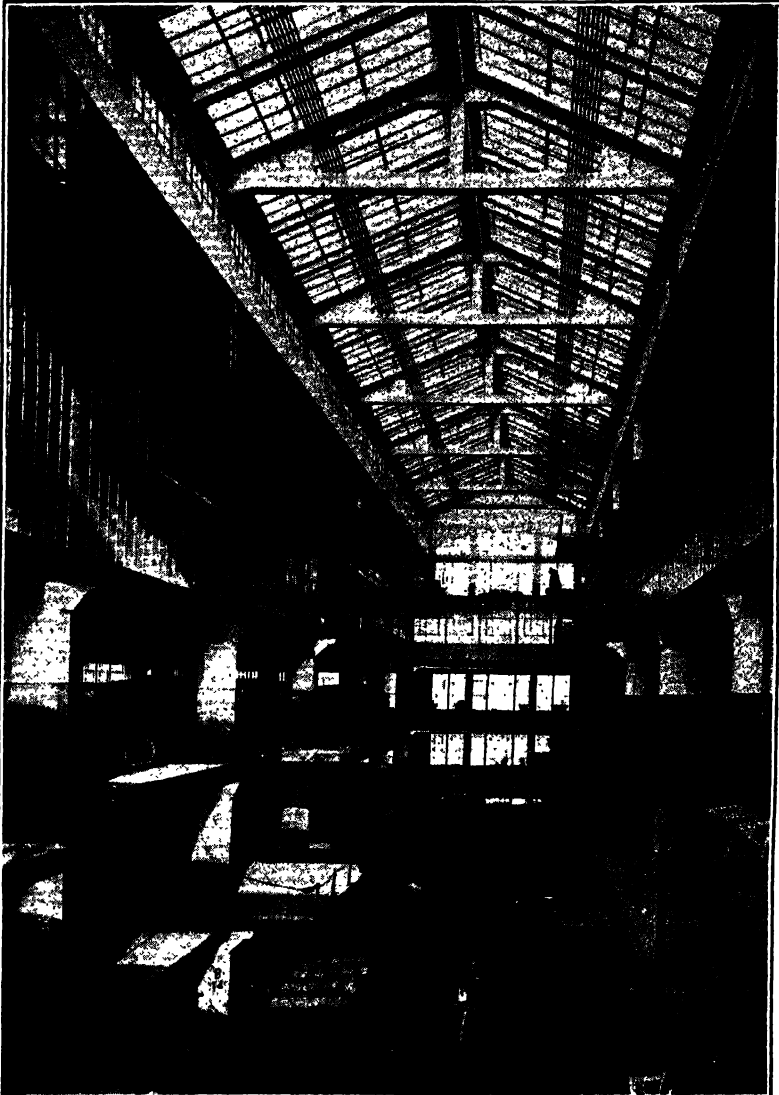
Concrete King post trusses—Ford Motor Co. building, Chicago.
